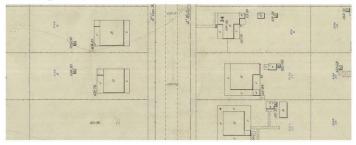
Sewer plan 1928. SROWA_series634_cons4156_item2141
